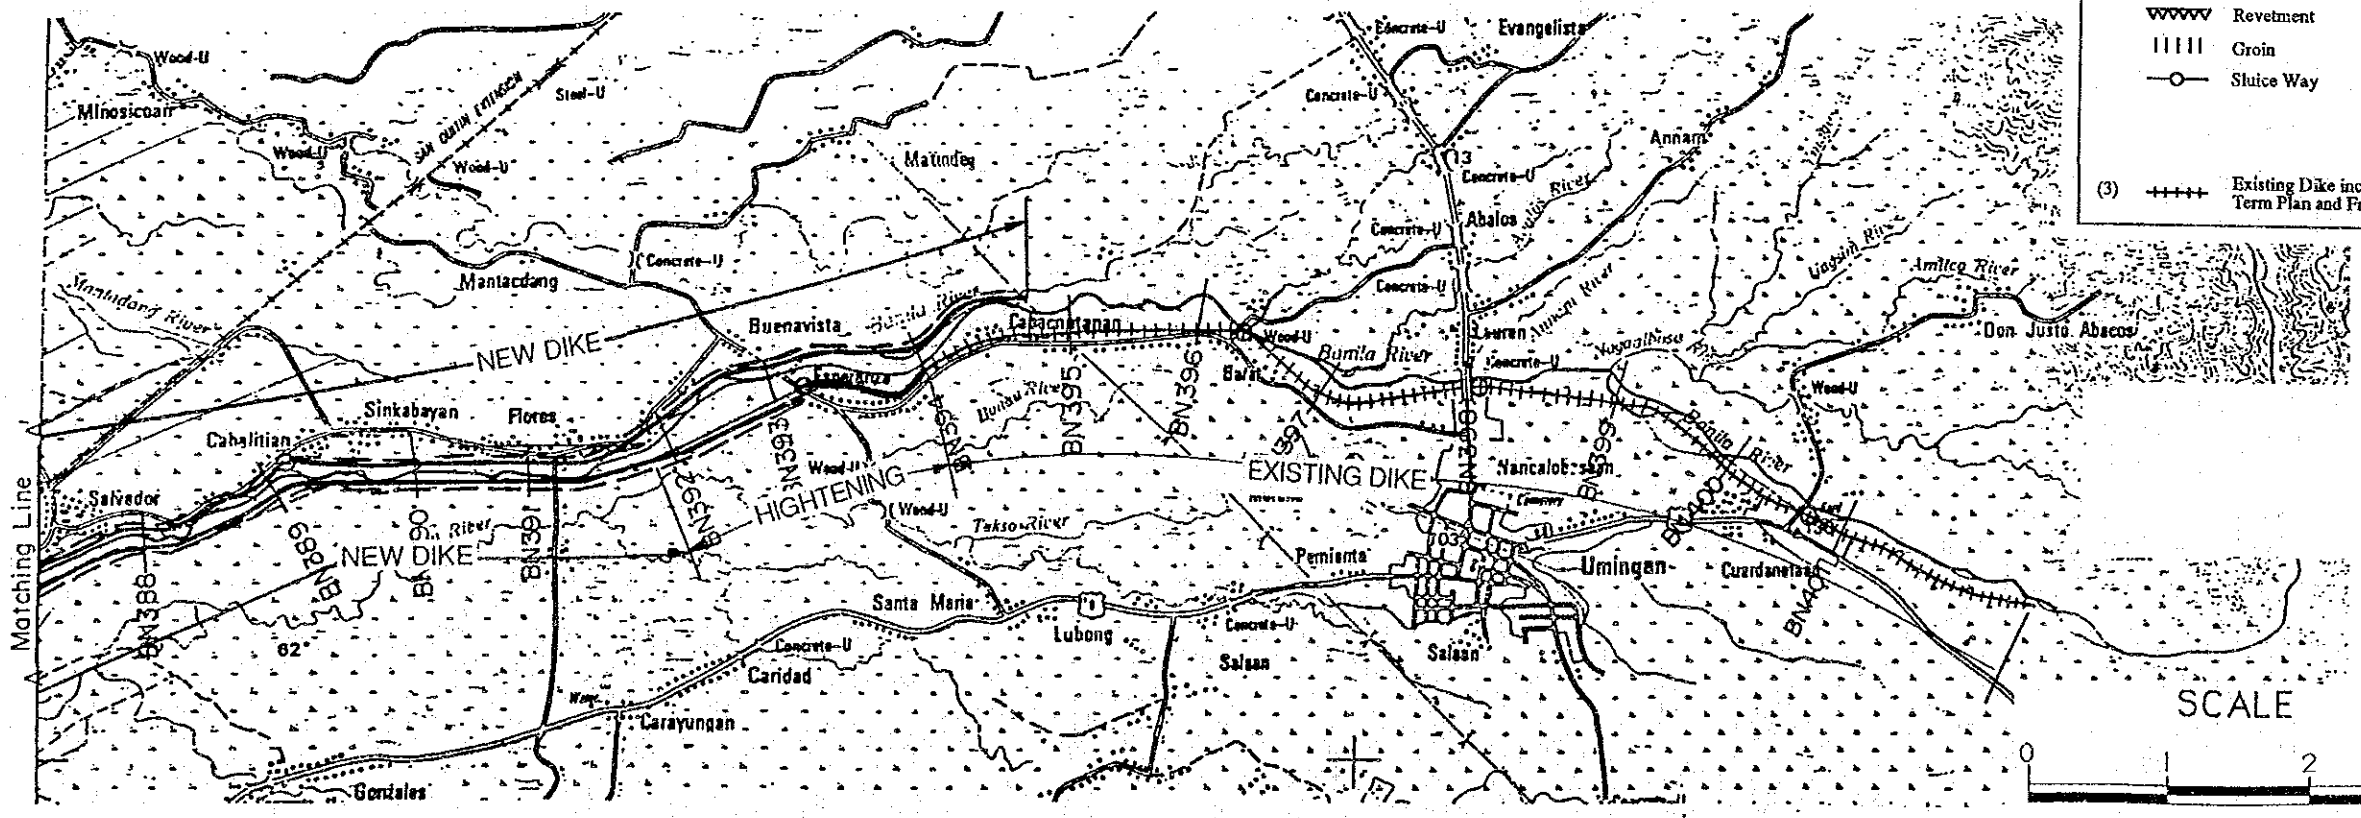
DESIGN PLAN OF BANILA RIVER
